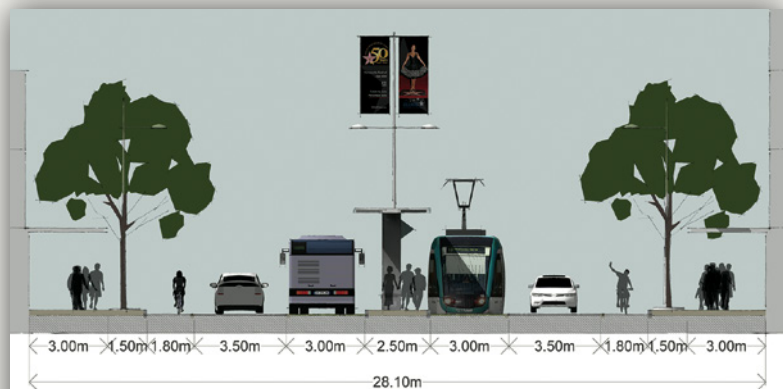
Alternative section through urban greenway (mixed traffic zone)
